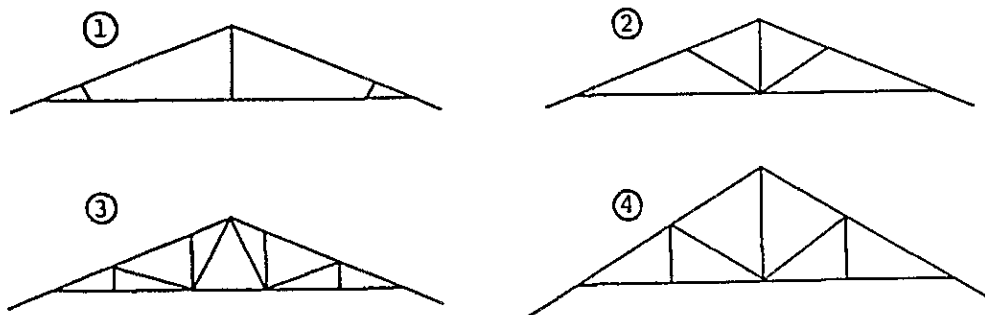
ROOF TRUSS SYSTEM IN PERUMNAS HOUSING
